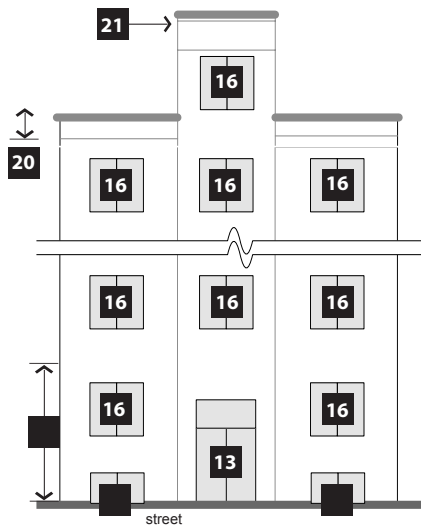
Civic building street facade diagram shown with parapet roof type. Not to scale.
